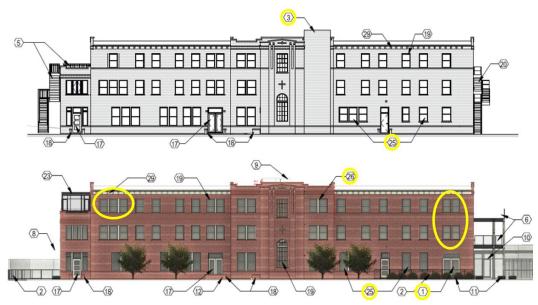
Existing (top) and proposed east elevation (façade) of 2543 4th St. Cropped to show historic portion of building. Numbers noted in narrative highlighted. New window openings indicated by staff.
